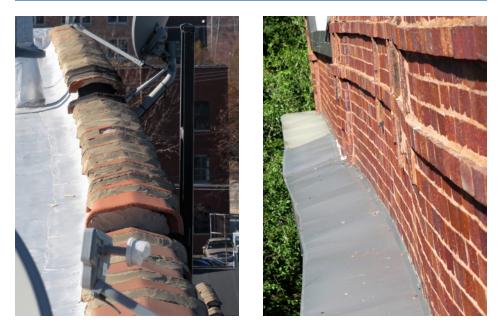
Two examples of masonry wall bowing due to lack of movement joints.
